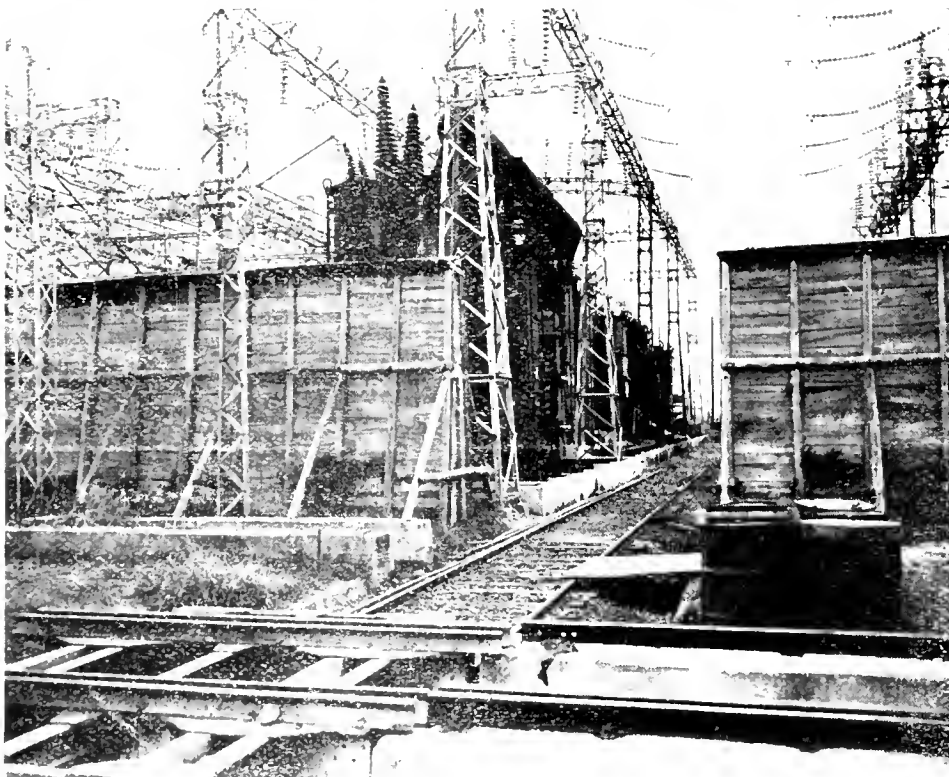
Iwakura Transformer banks, damaged transformers on far end
